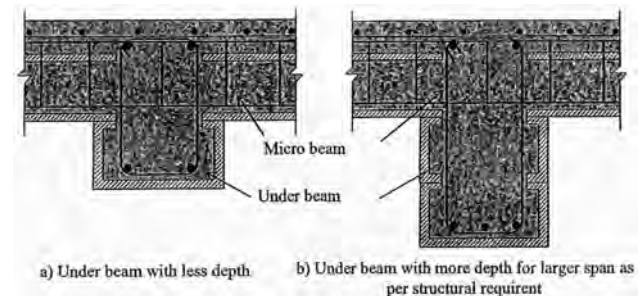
GFRG-RC composite embedded cross beam/under beam in long span floors
